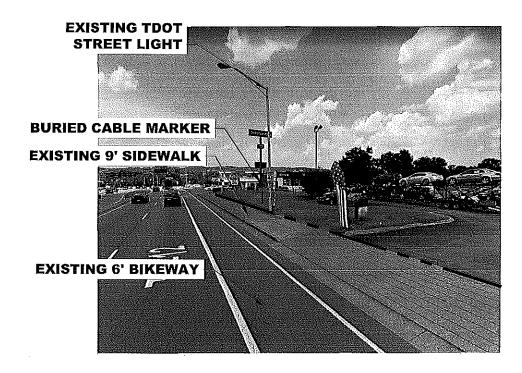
NORTH ALONG ROSA L PARKS BLVD
